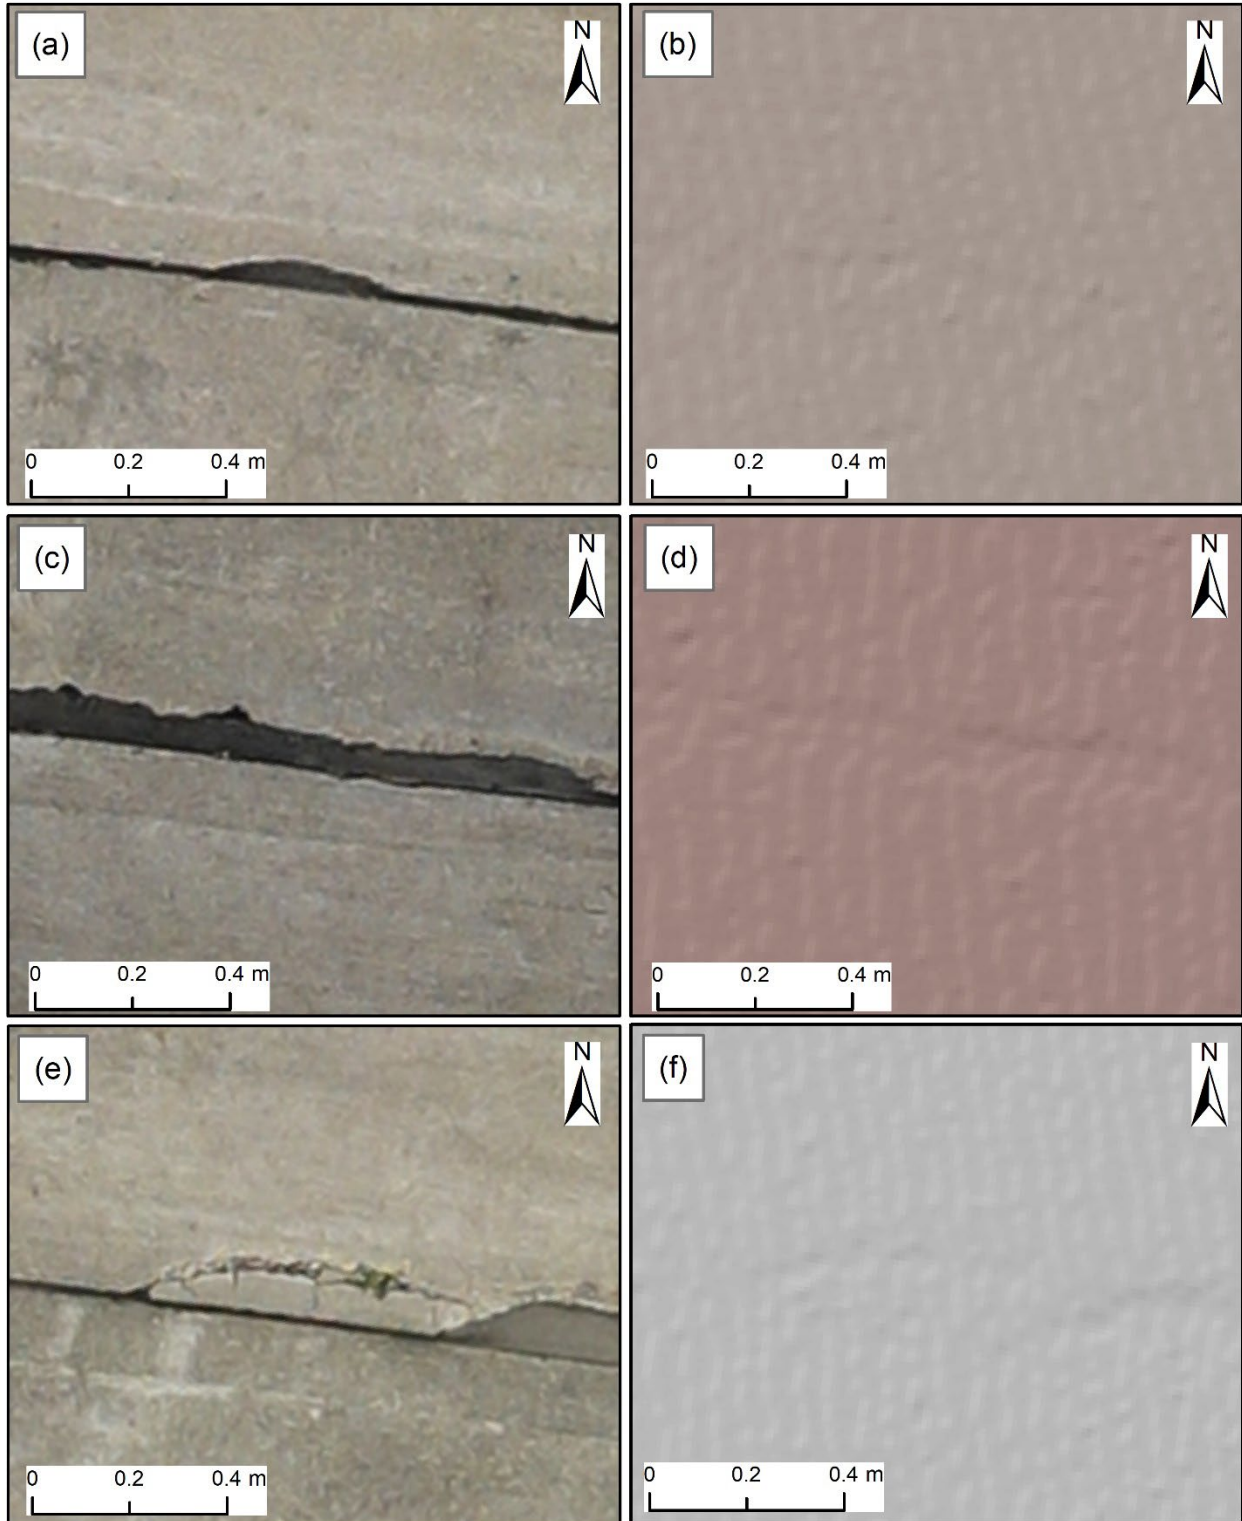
Joint Spalling (L) in (a) 2.5-mm/pix Orthophoto and (b) 10-mm/pix DEM; Joint Spalling (M) in (c) 2.5-mm/pix Orthophoto and (d) 10-mm/pix DEM; and Joint Spalling (H) in (e) 2.5-mm/pix Orthophoto and (f) 10-mm/pix DEM
